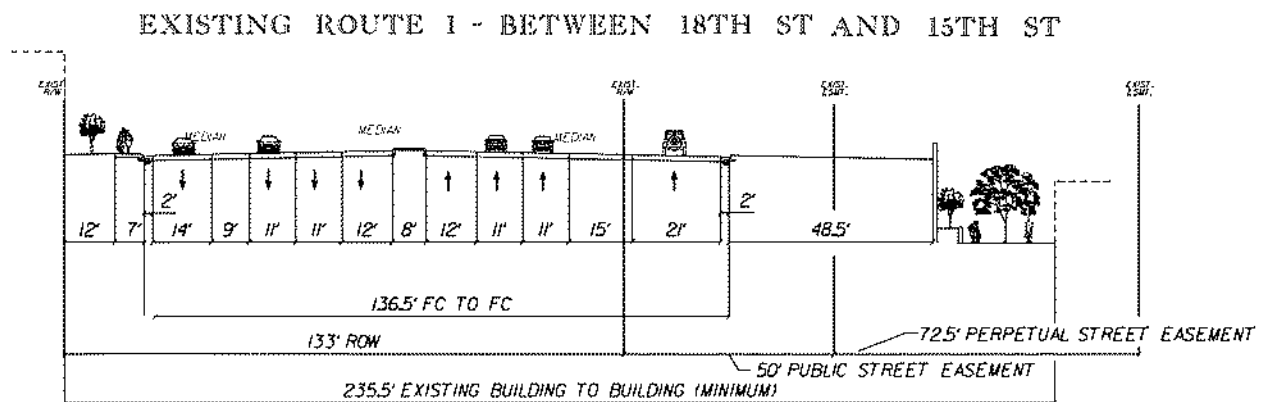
Existing Route 1 – Between 18th Street S and 15th Street S Cross Section (looking north)
